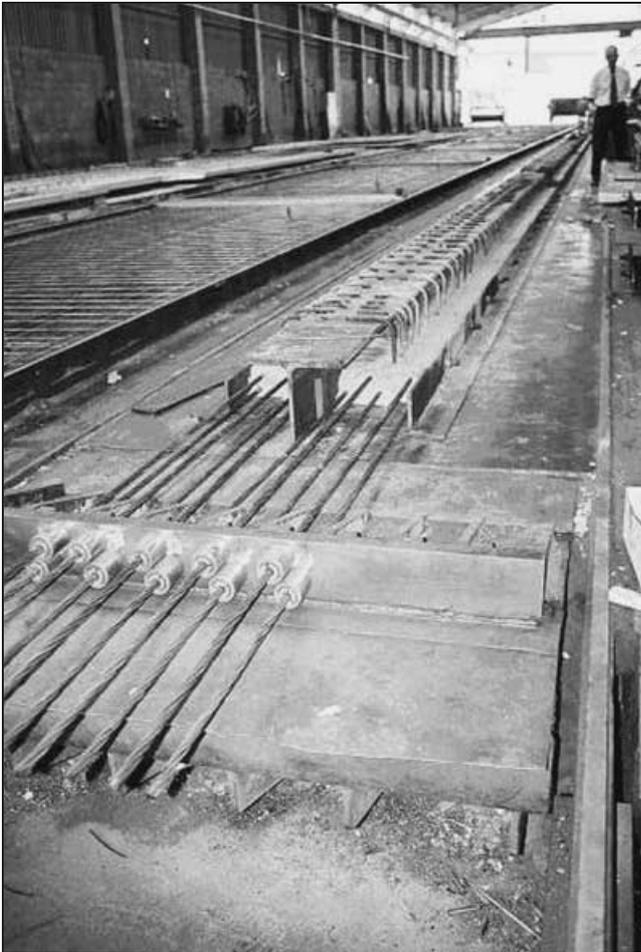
Steel skeleton and manufacturing process after casting of bottom concrete layer
